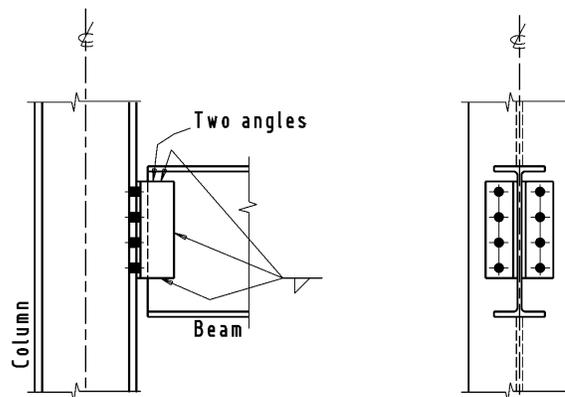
Shop-bolted or shop-welded connection angles to the beam web.
